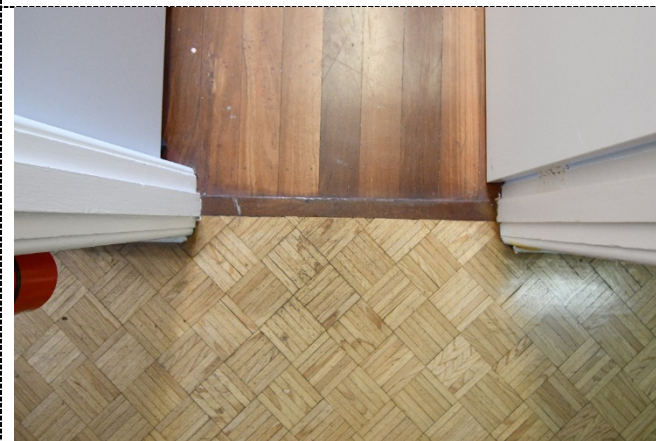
Interior view ground floor parquetry hallway floor and timber board flooring in Room 5 of high integrity.
